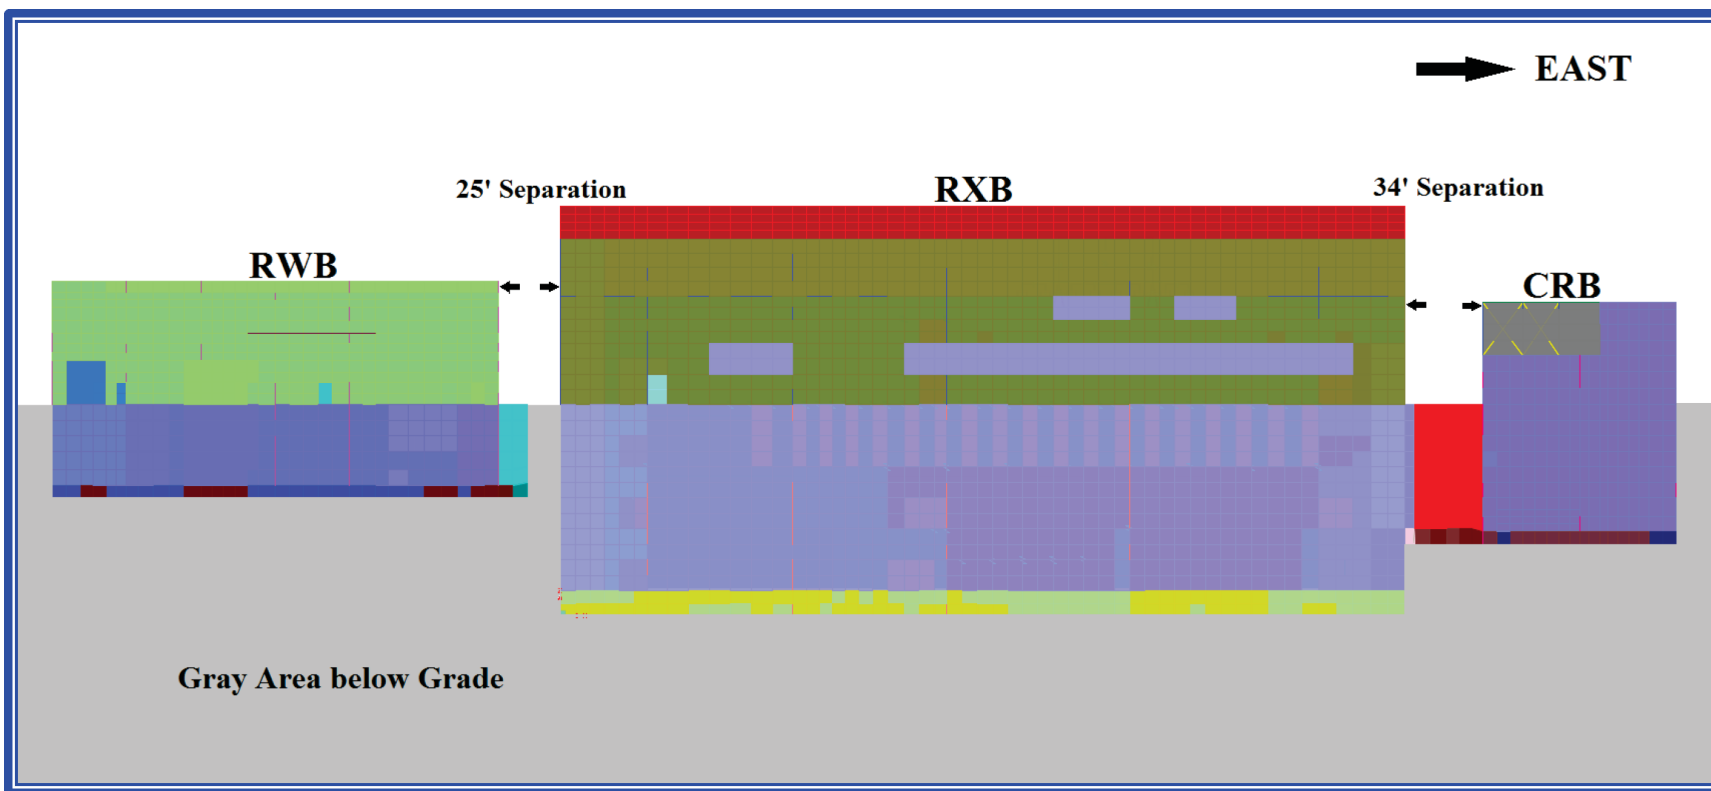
Isometric View of SASSI2010 Triple Building
